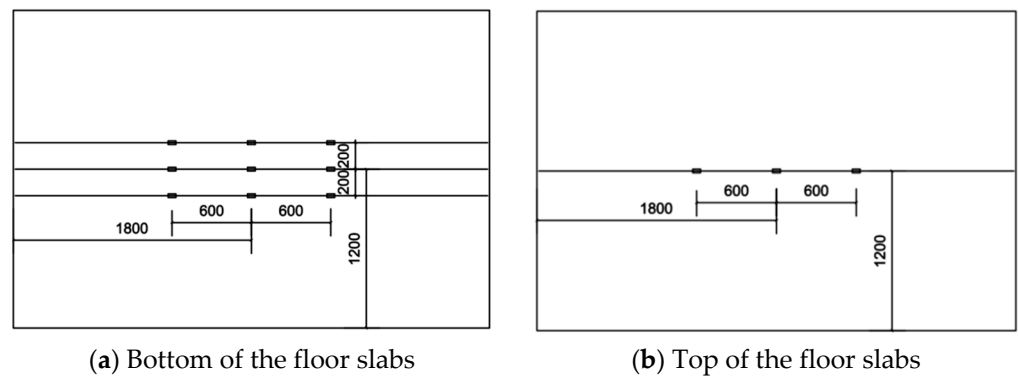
Layout of measurement points for reinforcement strain gauges (unit: mm).
